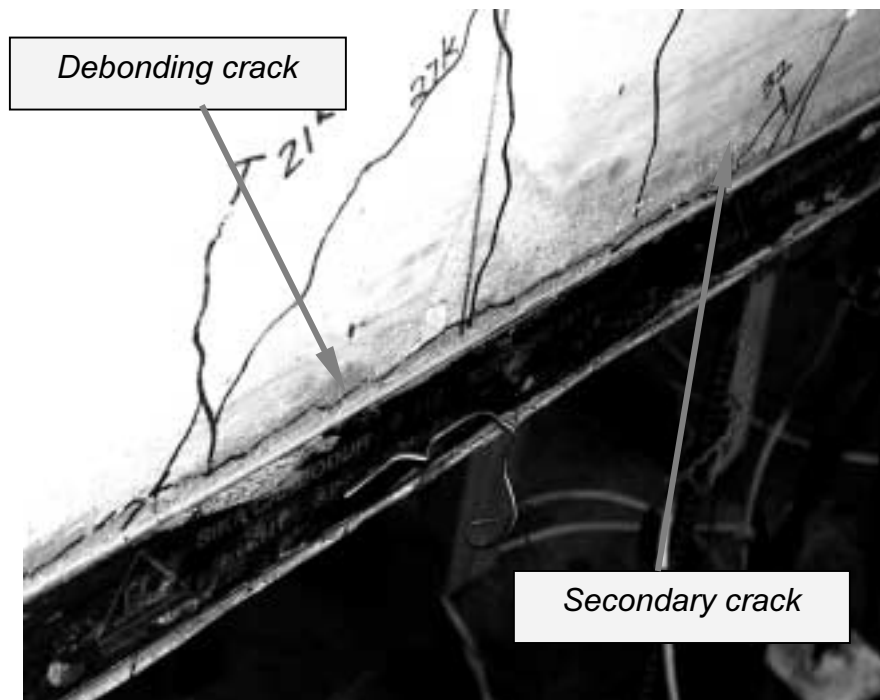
Close-up of Debonding Crack that Originated from a Secondary Crack in Specimen D3
